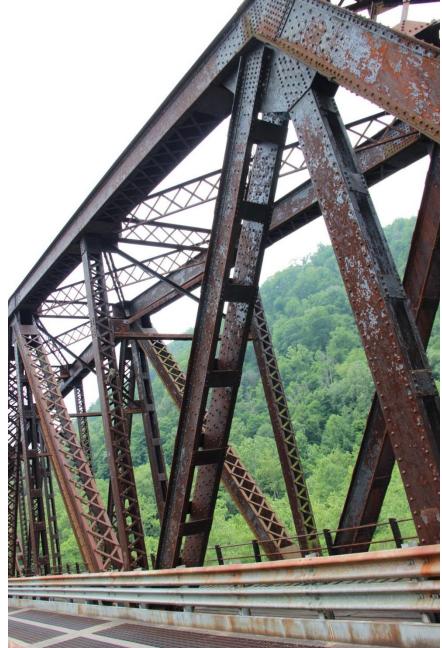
DETAIL OF MAIN WARREN TRUSS SPAN SHOWING VERTICAL AND DIAGONAL MEMBERS, TOP CHORD, AND CROSS BRACING, FACING SOUTHWEST.
